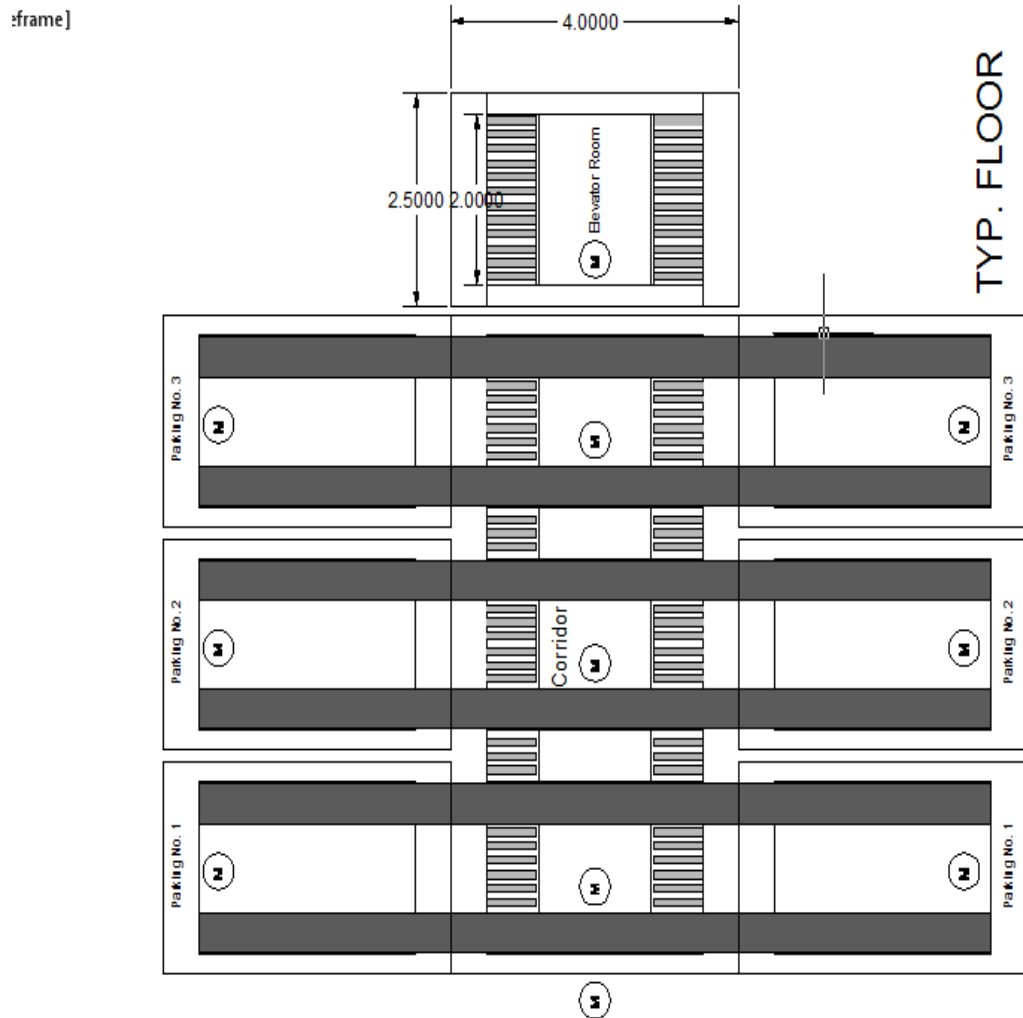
Typical Floor Plan [by AutoCAD]
